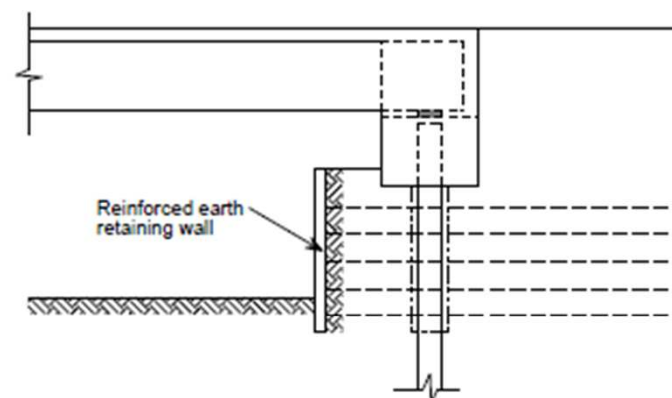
Framed abutment - with reinforced earth retaining wall
